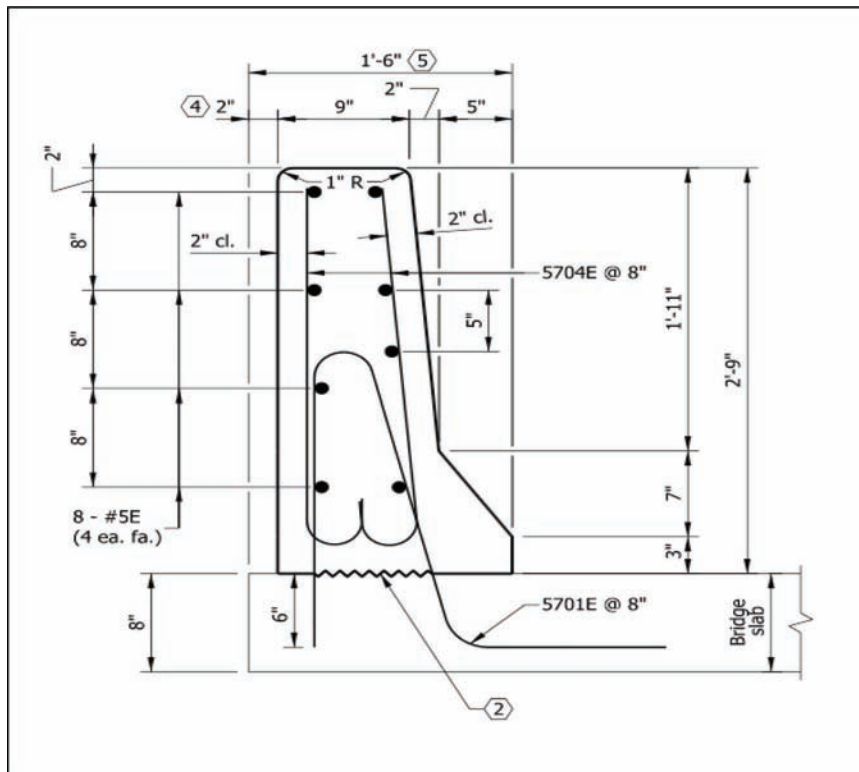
Type FC bridge railing detail (INDOT, 2015).
